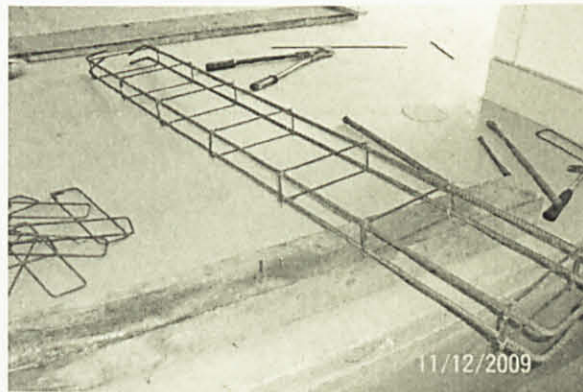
Completed steel reinforcement bars and the rebars are tying using the steel wires
